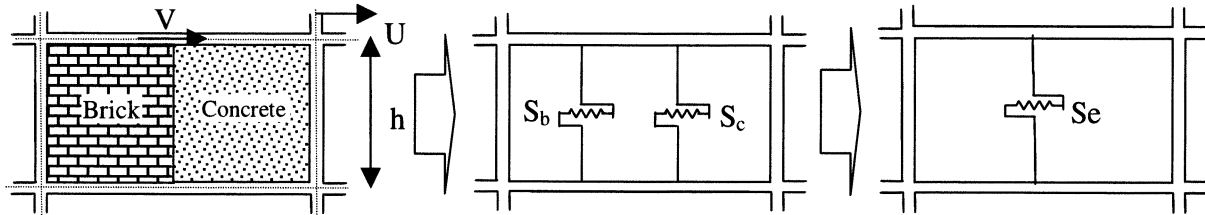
g. Infill vertically multipart masonry walls Type H.
